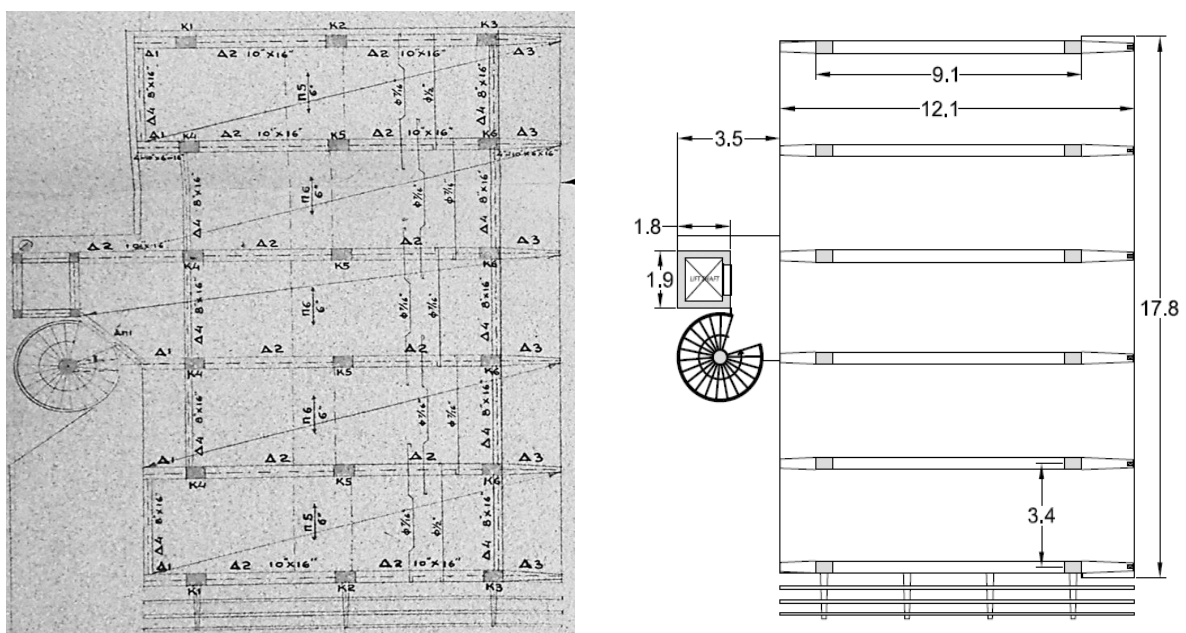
Typical floor plan as per: the original design (left) [7] and the survey plan (right)
